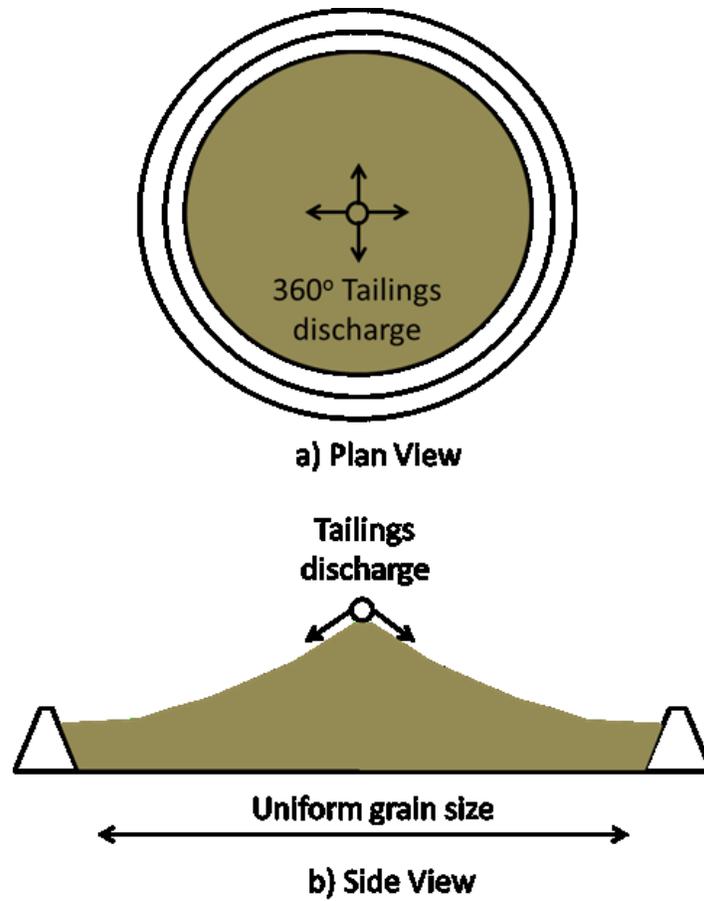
Thickened or Paste tailings deposition a) plan view of a central discharge, b) Cross section of a central discharge thickened tailings stack (modified from AI and Blowes 1999).
